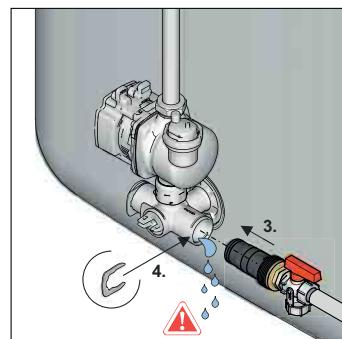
Assembling the KFE filling connection in the connecting elbow
